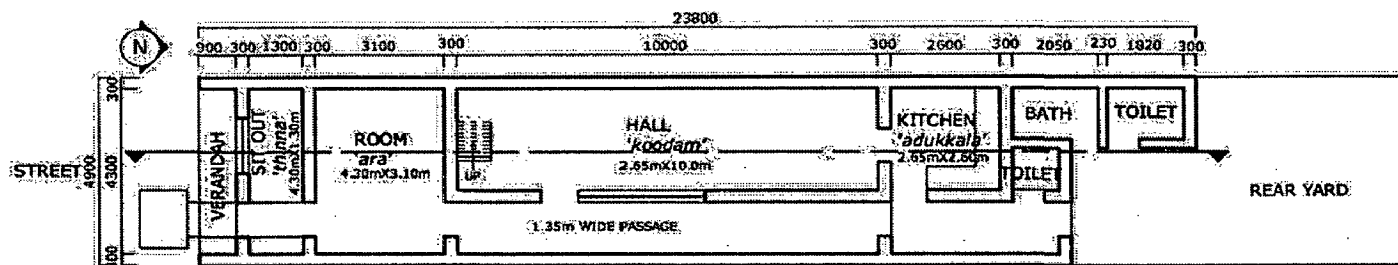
Ground floor plan of residence 2, in Vadakkencherry agraharam
